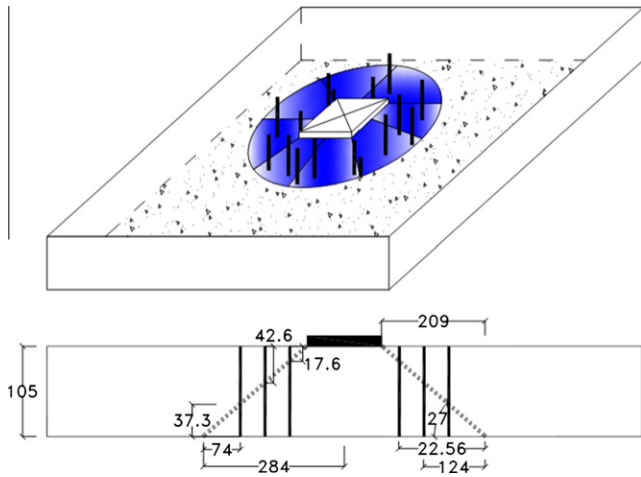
Shear punch cone, strengthening line and middle plane section in slabs.
